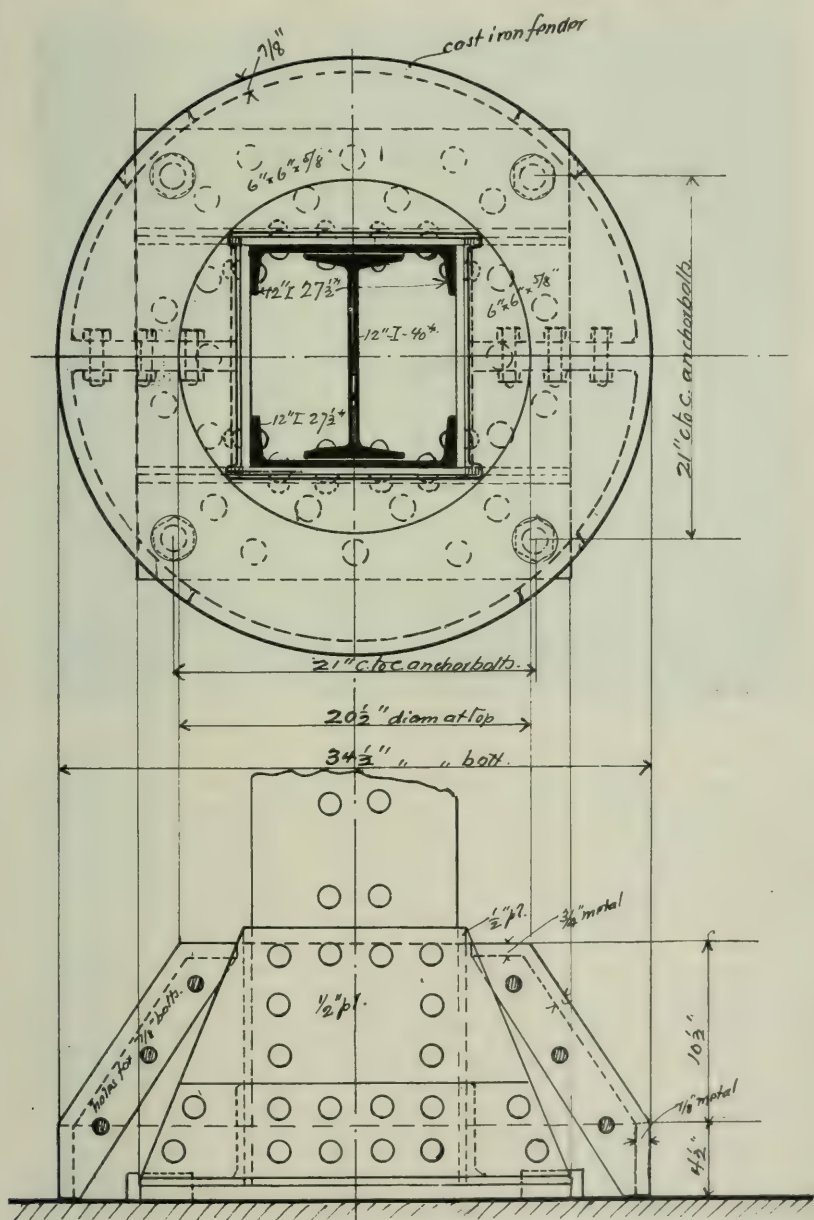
Details of Foot of Center Column of Deck Bridges.
